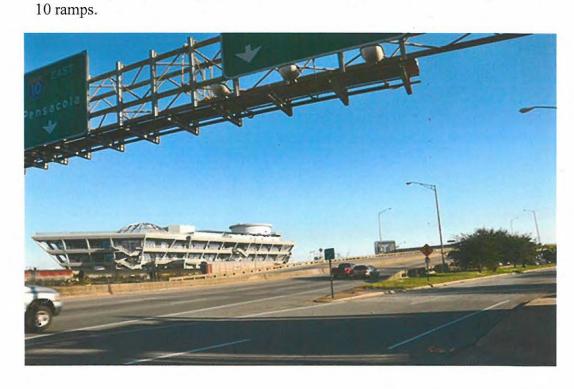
Southeast corner of the Church Street East Historic District/Old Southern Market and Old City Hall looking south at I-10 ramp, overhead signs, and air
